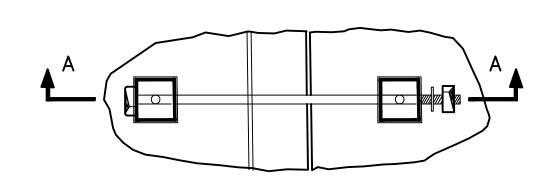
DETAIL OF PIPE UNDERDRAIN / FIELD TILE
